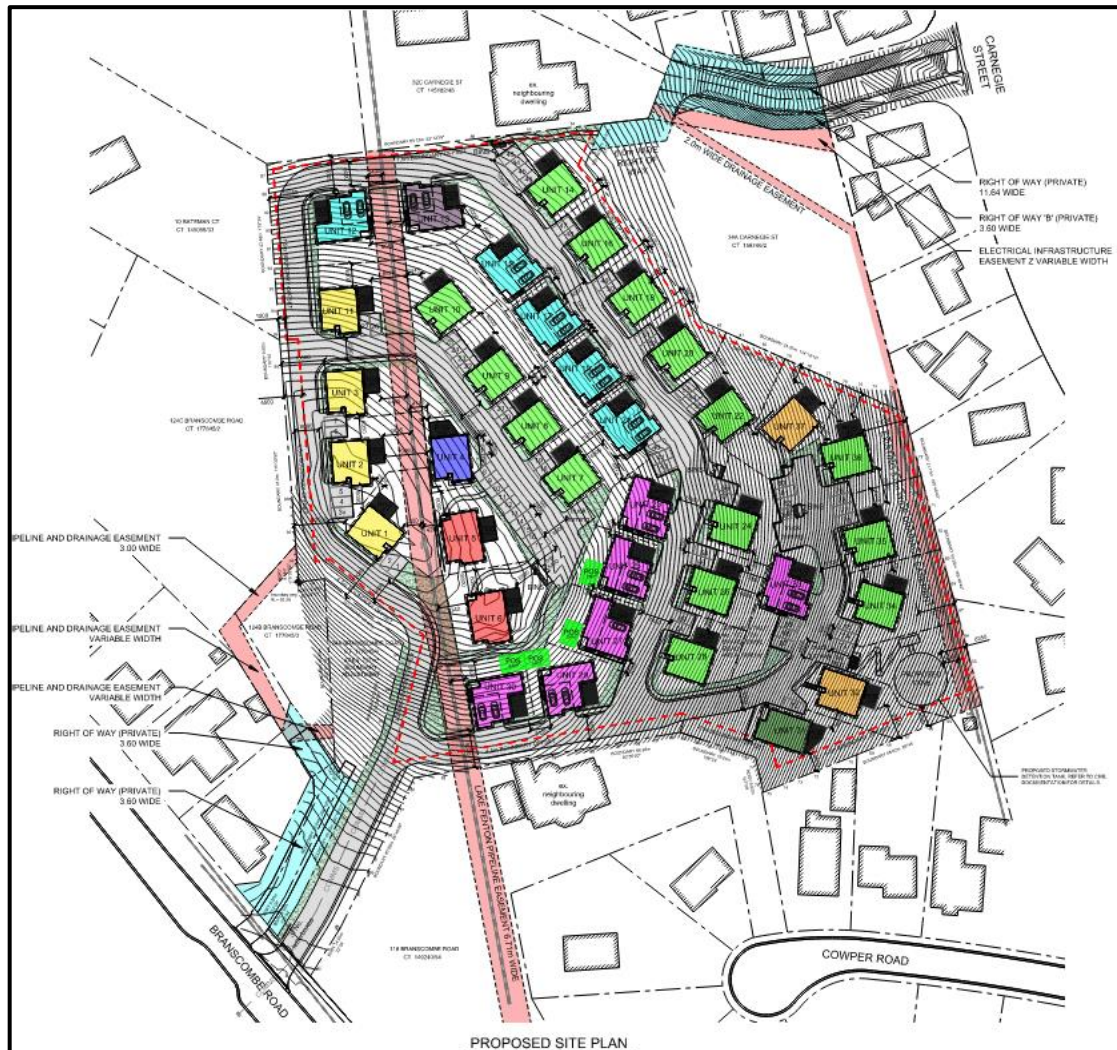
The site plan showing the layout of the various dwelling types on the subject site.
